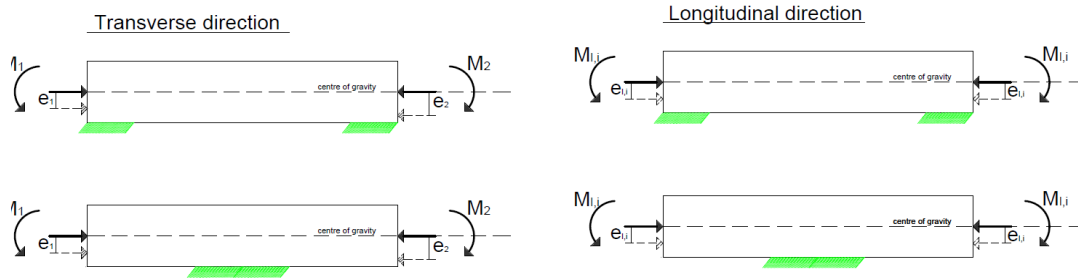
EXTERNAL FORCES BEAM ON ELASTIC FOUNDATION
